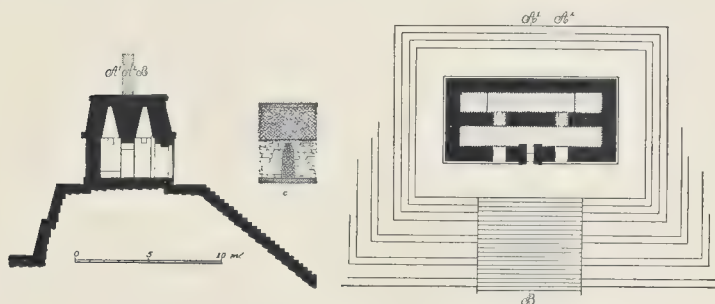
STRUCTURE 30: SECTION AND GROUND-PLAN (RESTORED).
